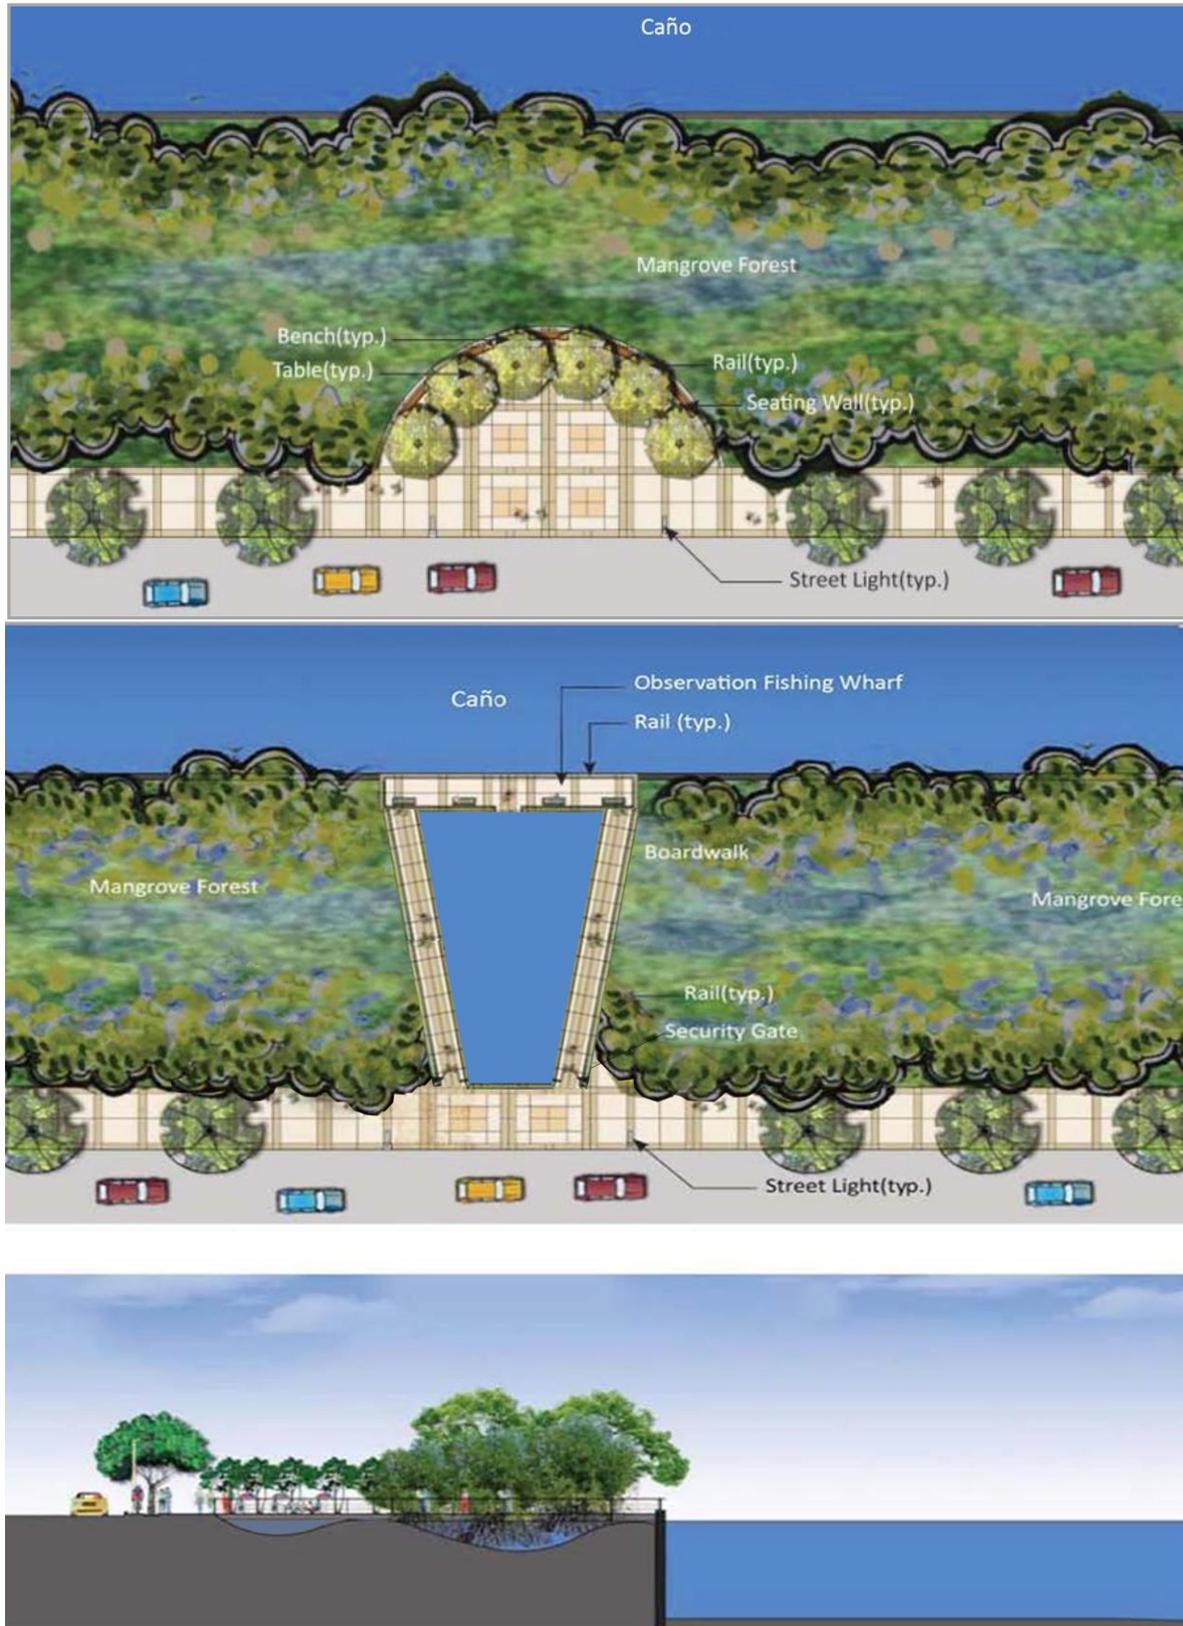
Prototype Recreation Park Design (a) no trail (b) with trail
